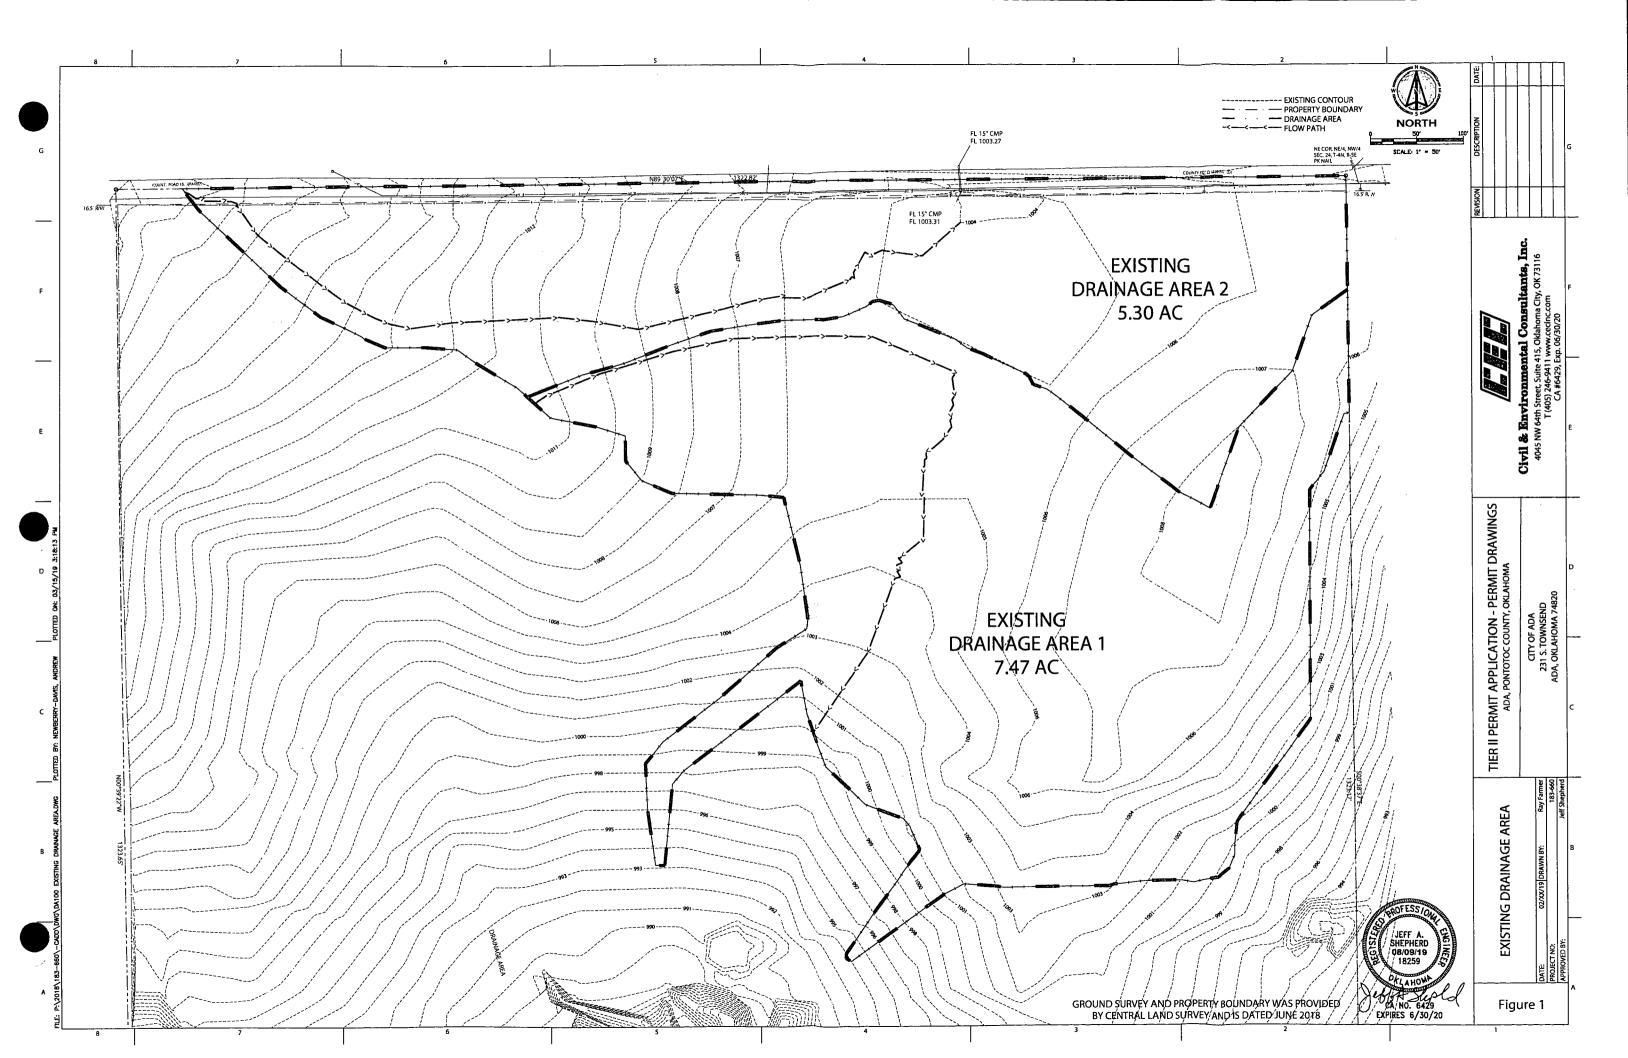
FIGURE B STORMWATER DESIGN EXISTING AND PROPOSED DRAINAGE AREA MAPS
